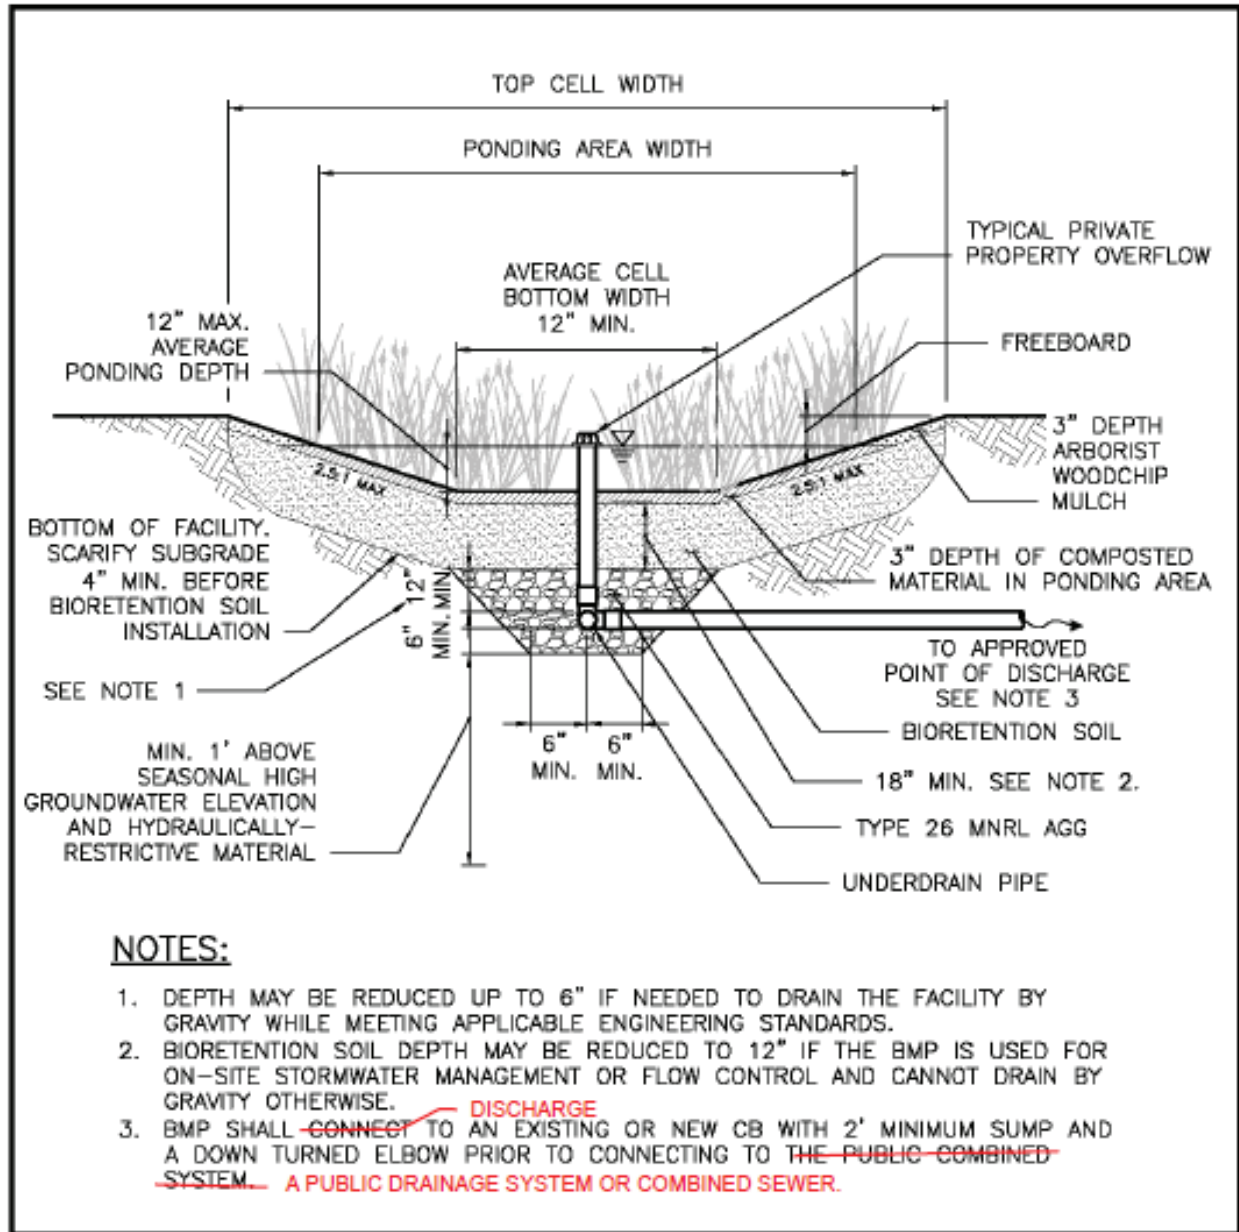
Infiltrating Bioretention Facility with Sloped Sides (with Underdrain).
